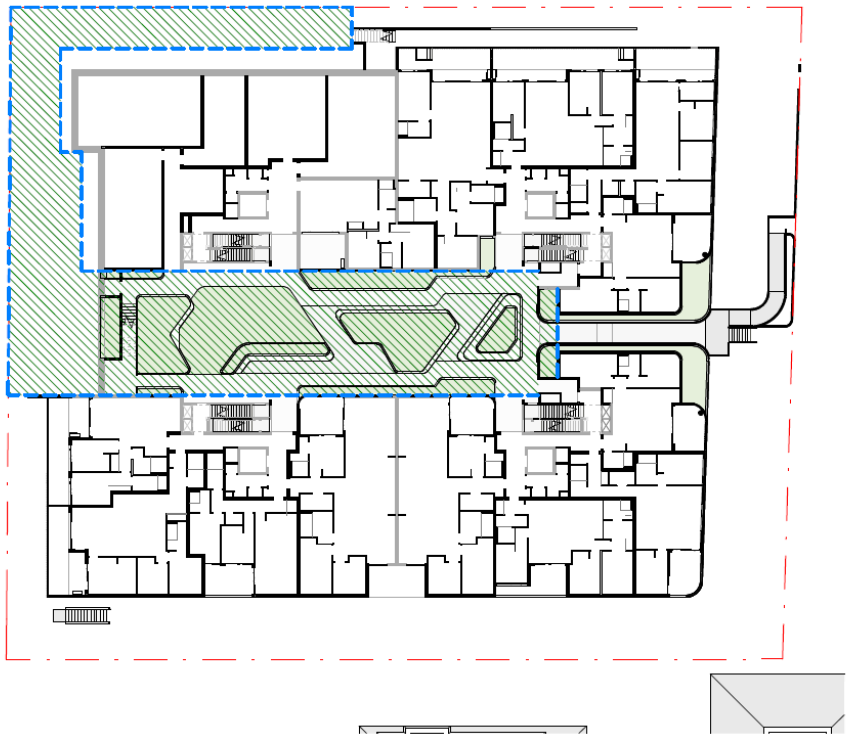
Communal Open Space Ground Floor (Source: GilesTribe)
